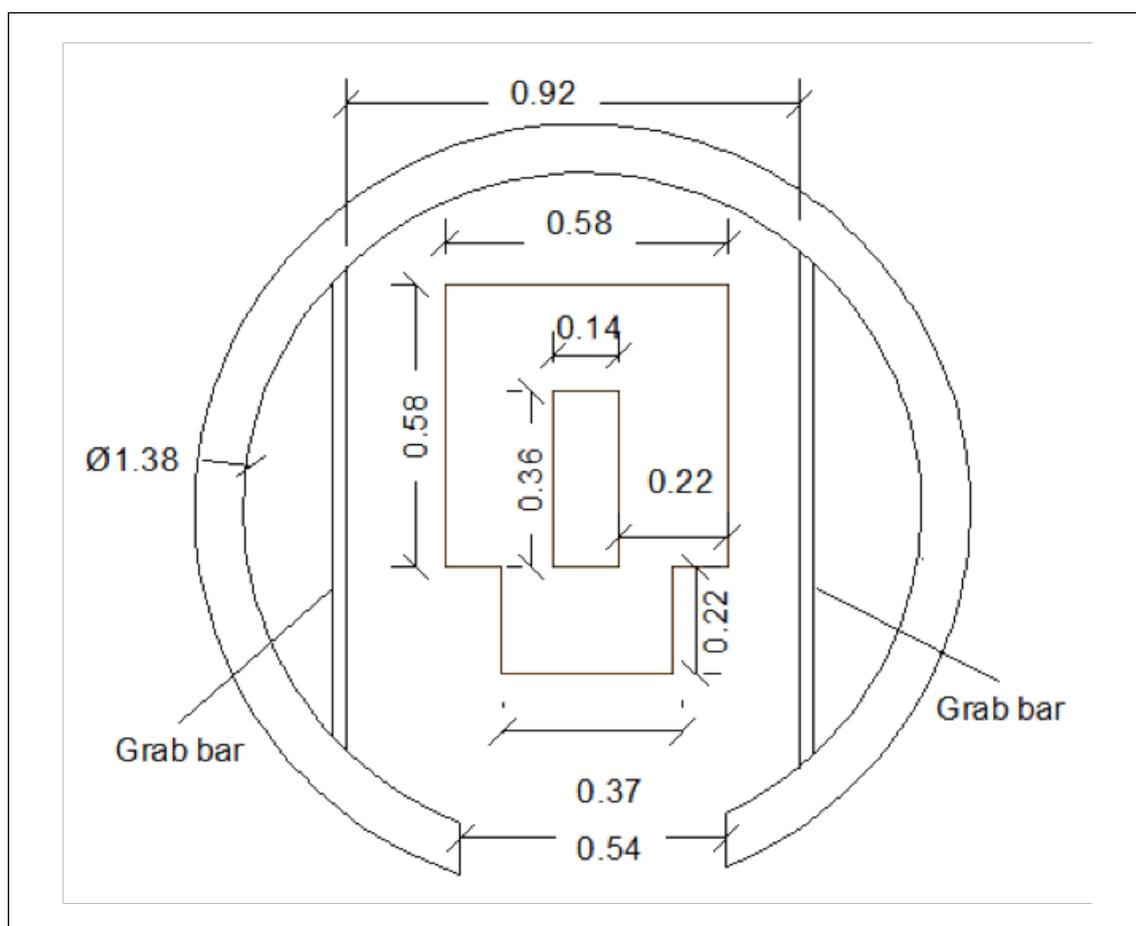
Plan view, Block seat and hand rails for a circular toilet
